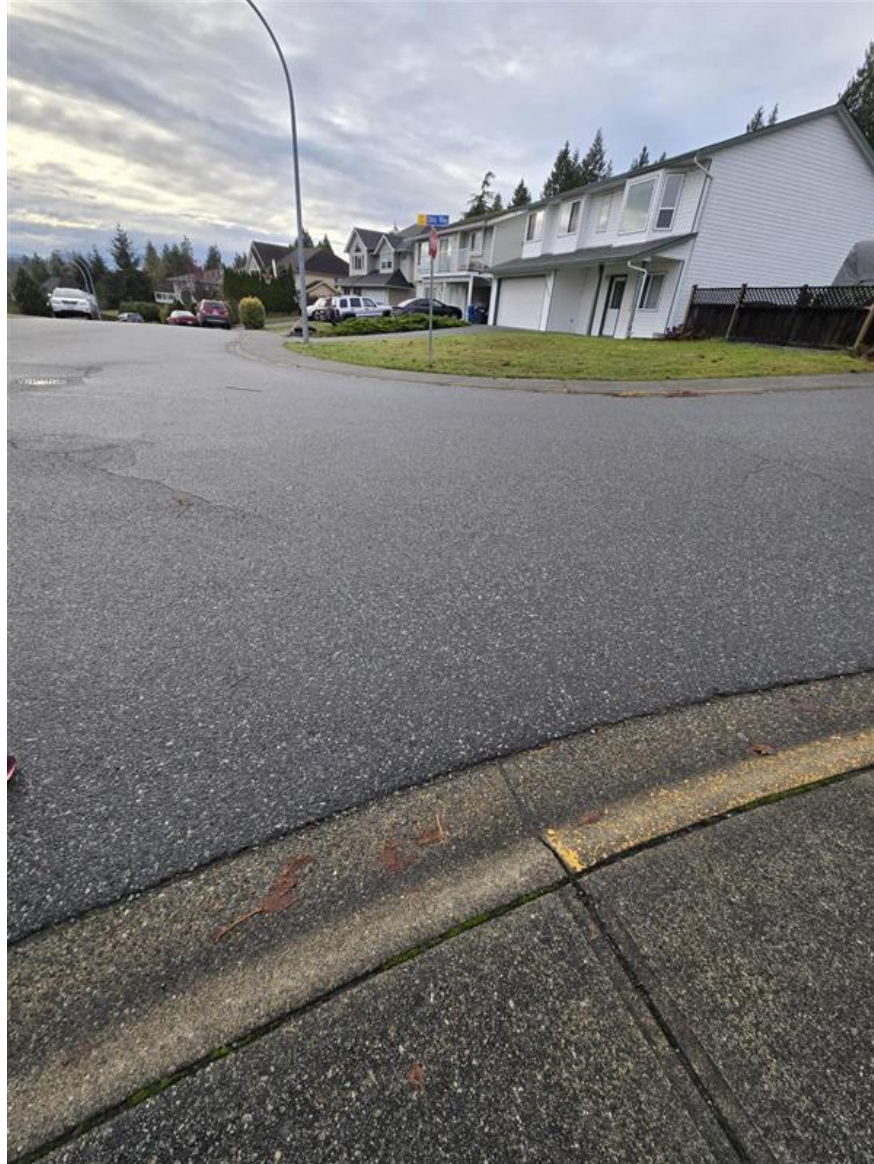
Potential Crosswalk Location at Entrance to School Via Ohio Way
